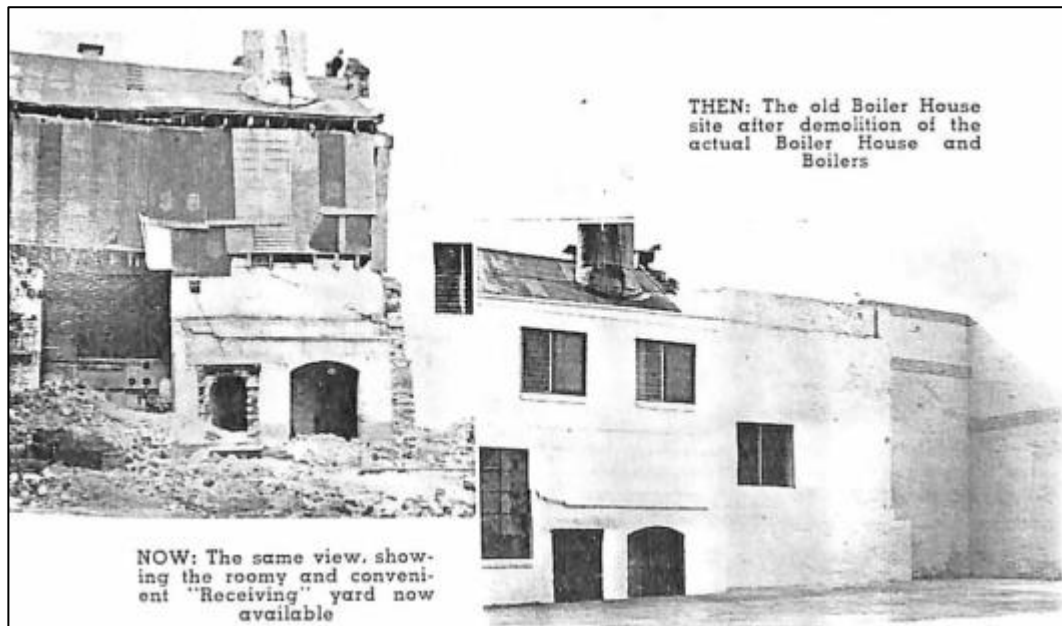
Photo of the Cadbury Fry Hudson Limited buildings before and after demolition of the boiler house (Thomson, n.d. : pg. 37). The dog legged wall of the cellar building is visible to the left which is likely the wall of the original still room.
